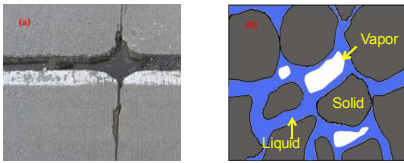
(a) Examples of Concrete Pavement Joints Deterioration and (b) schematic of conductive path
